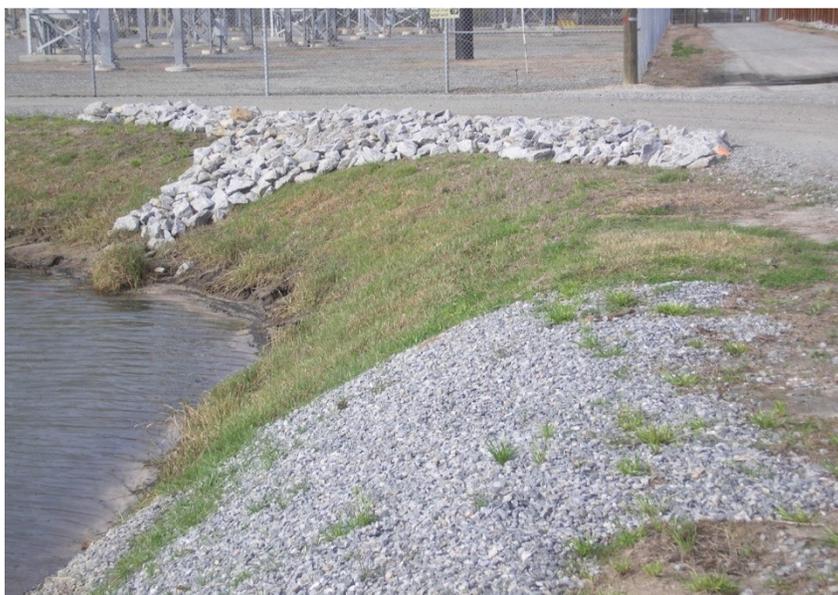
Groin Area in Northwest Corner of Embankment
